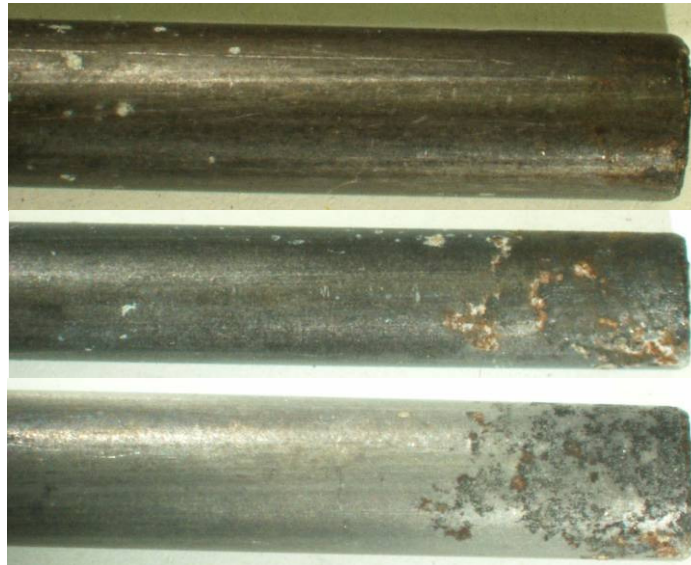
Reinforcing steel after corrosion testing from specimens 058 - with MCI 2005 NS
